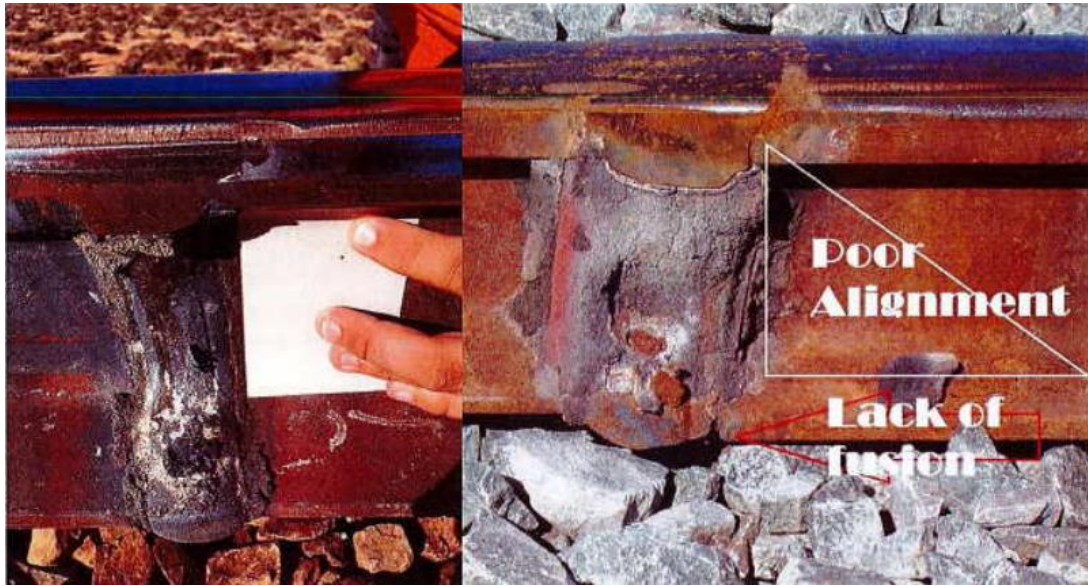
Failed weld due to misalignment of the weld collar
